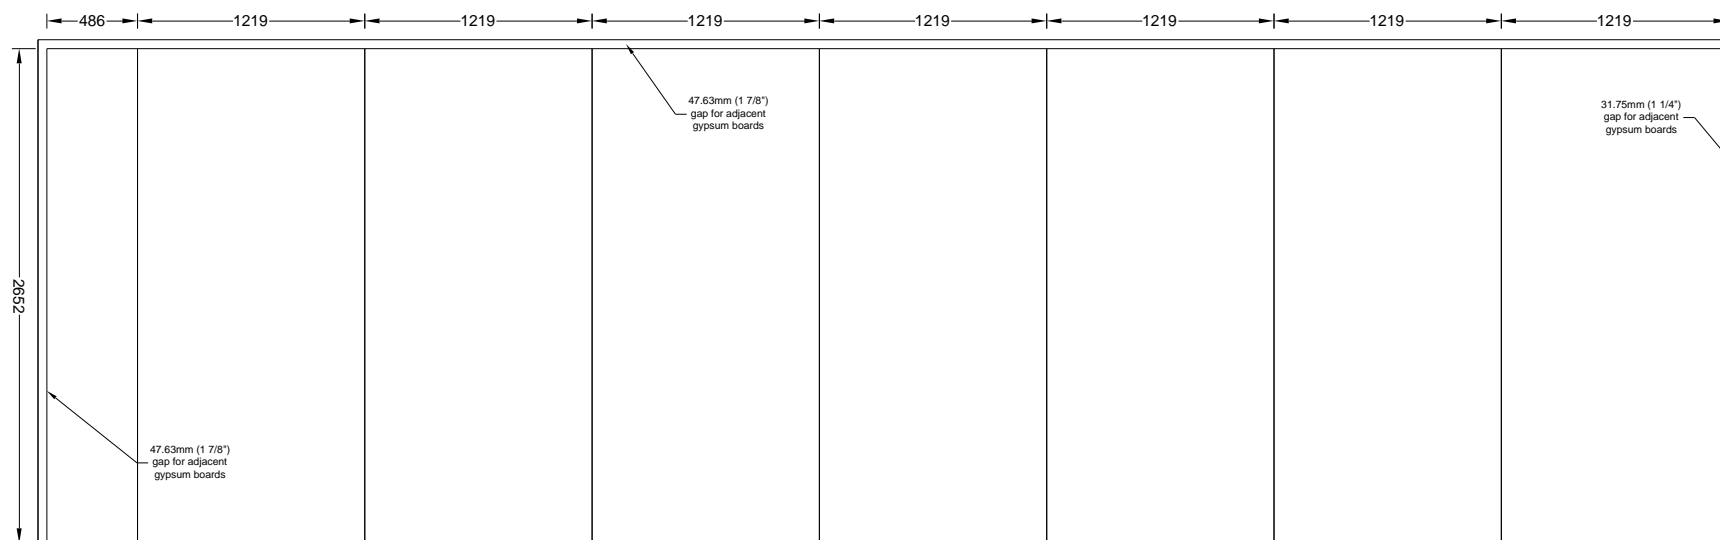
Test 1-2 Large Compartment CLT - W2 - Gypsum Layout - Face Layer
